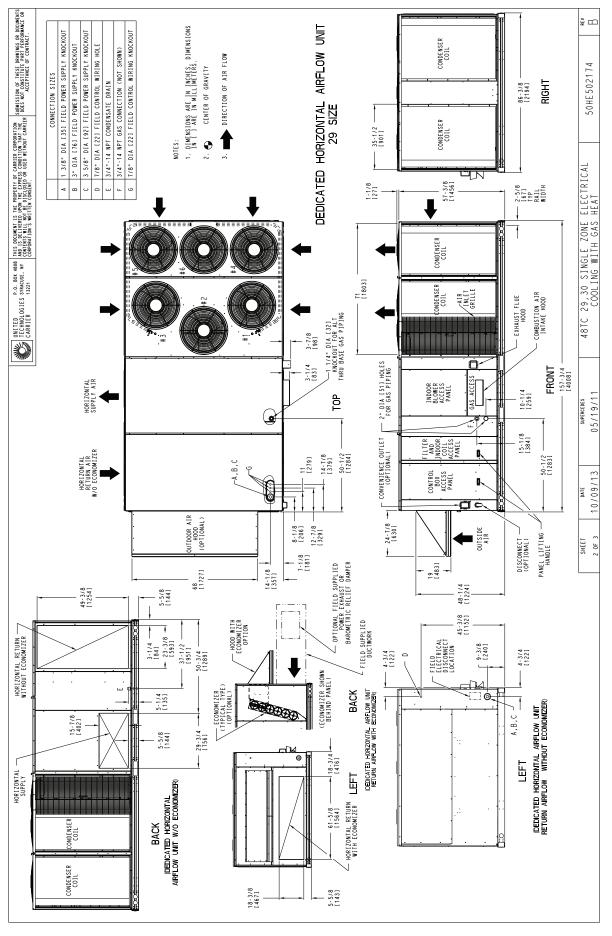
Unit Dimensional Drawing – 29 Size Unit
